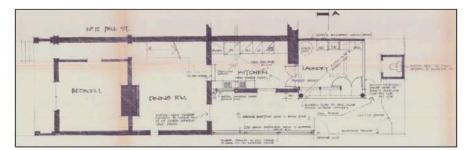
Proposed ground-floor plan. J. Greenwood (1984). Inner West Council Archives
